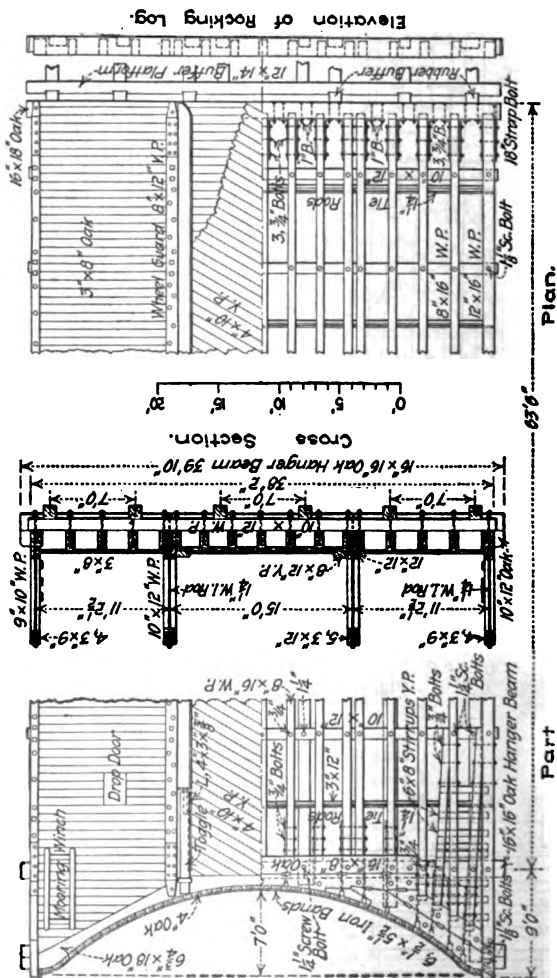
Part-Plan and Cross Section of Ferry Bridge. Elevation of Rocking Log.
